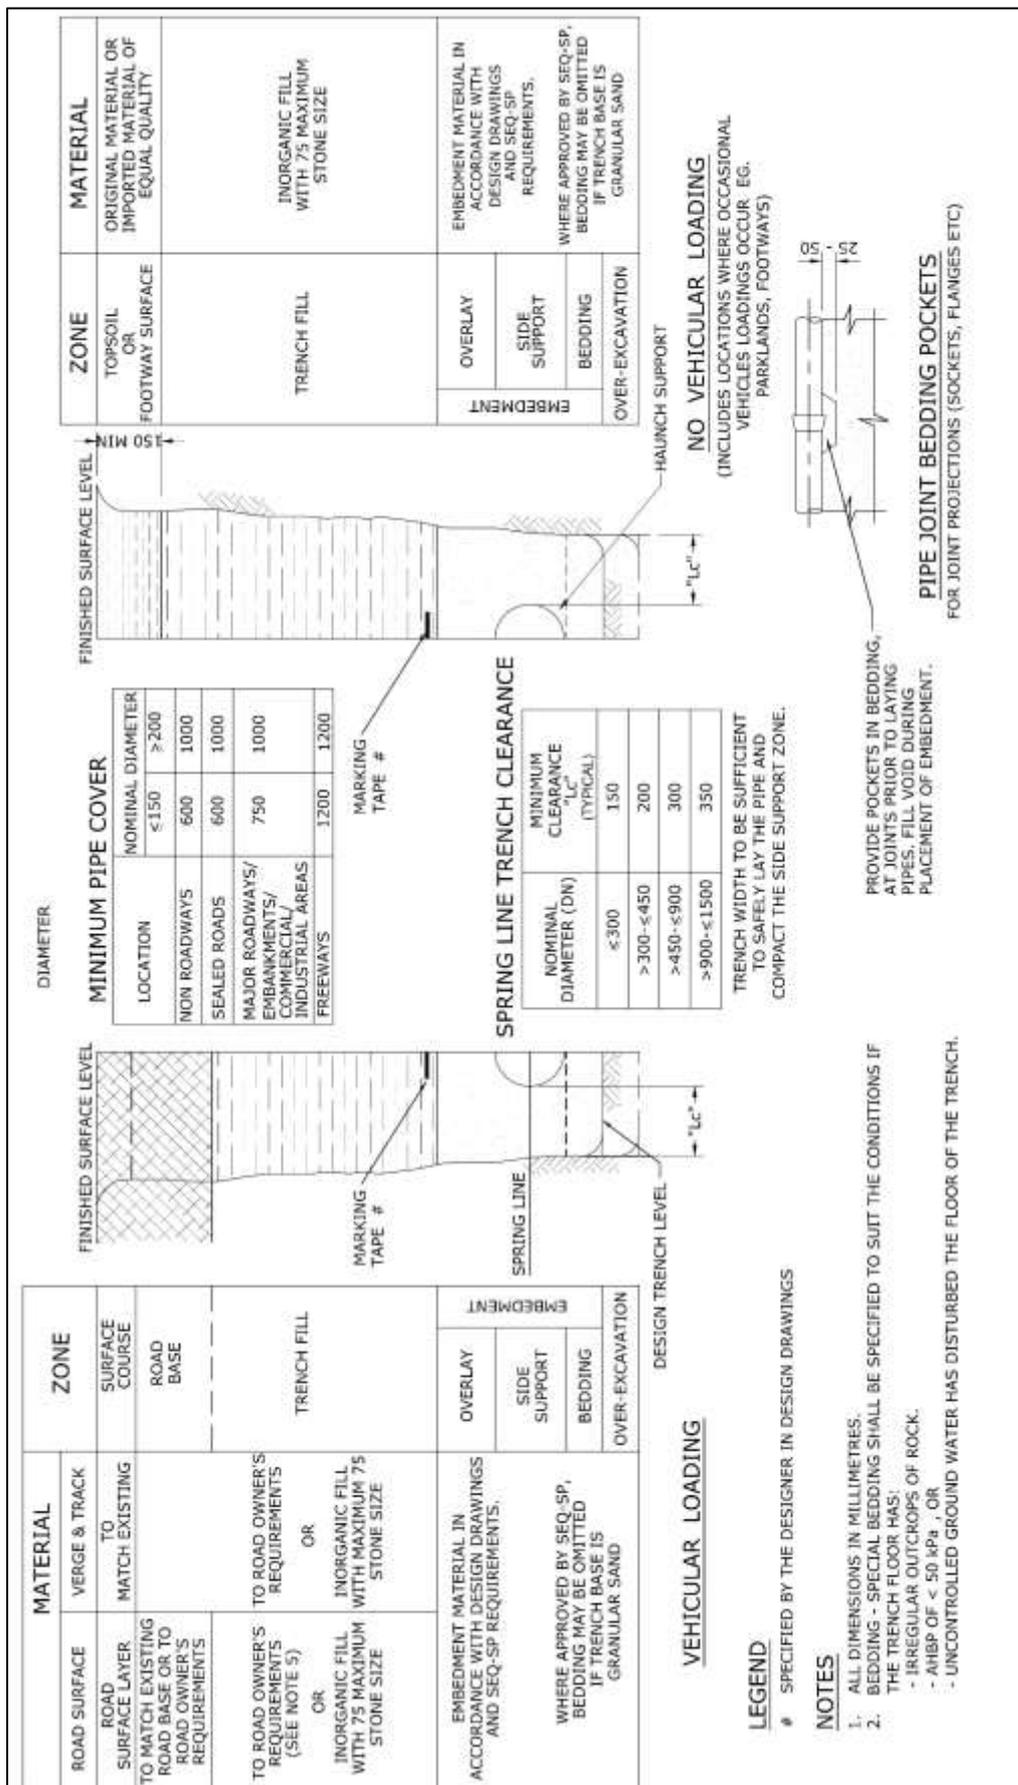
BURIED PIPE IN A TRENCH SHOWING THE EMBEDMENT AND TRENCHFILL ZONES
